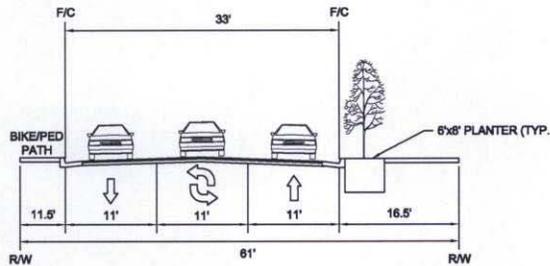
Bercut Drive Between Camille Lane and South Park Street (looking north)
